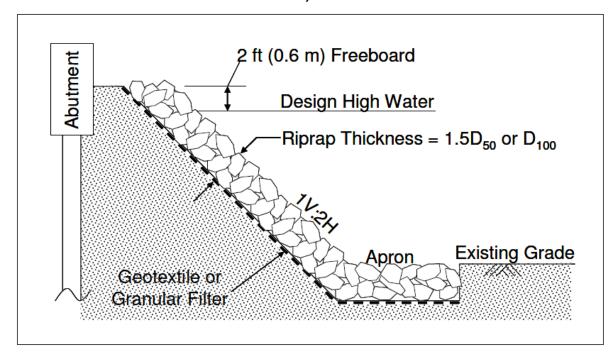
Typical Cross-Section for Abutment Riprap (Figure 14.8 from Ref. 6)
